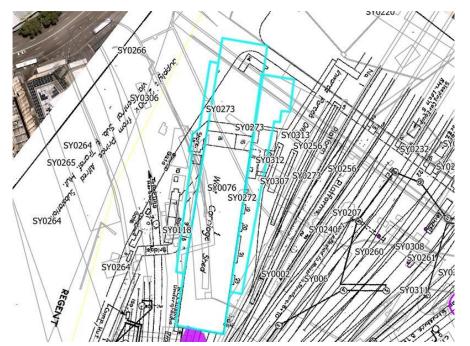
c.1953 plan. Source: Sydney Trains Virtual Plan Room.
